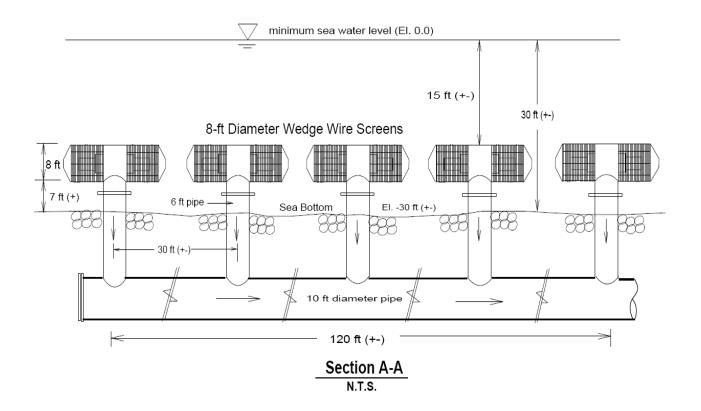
Sectional View of Wedge Wire Screen Intake Modular Assembly
